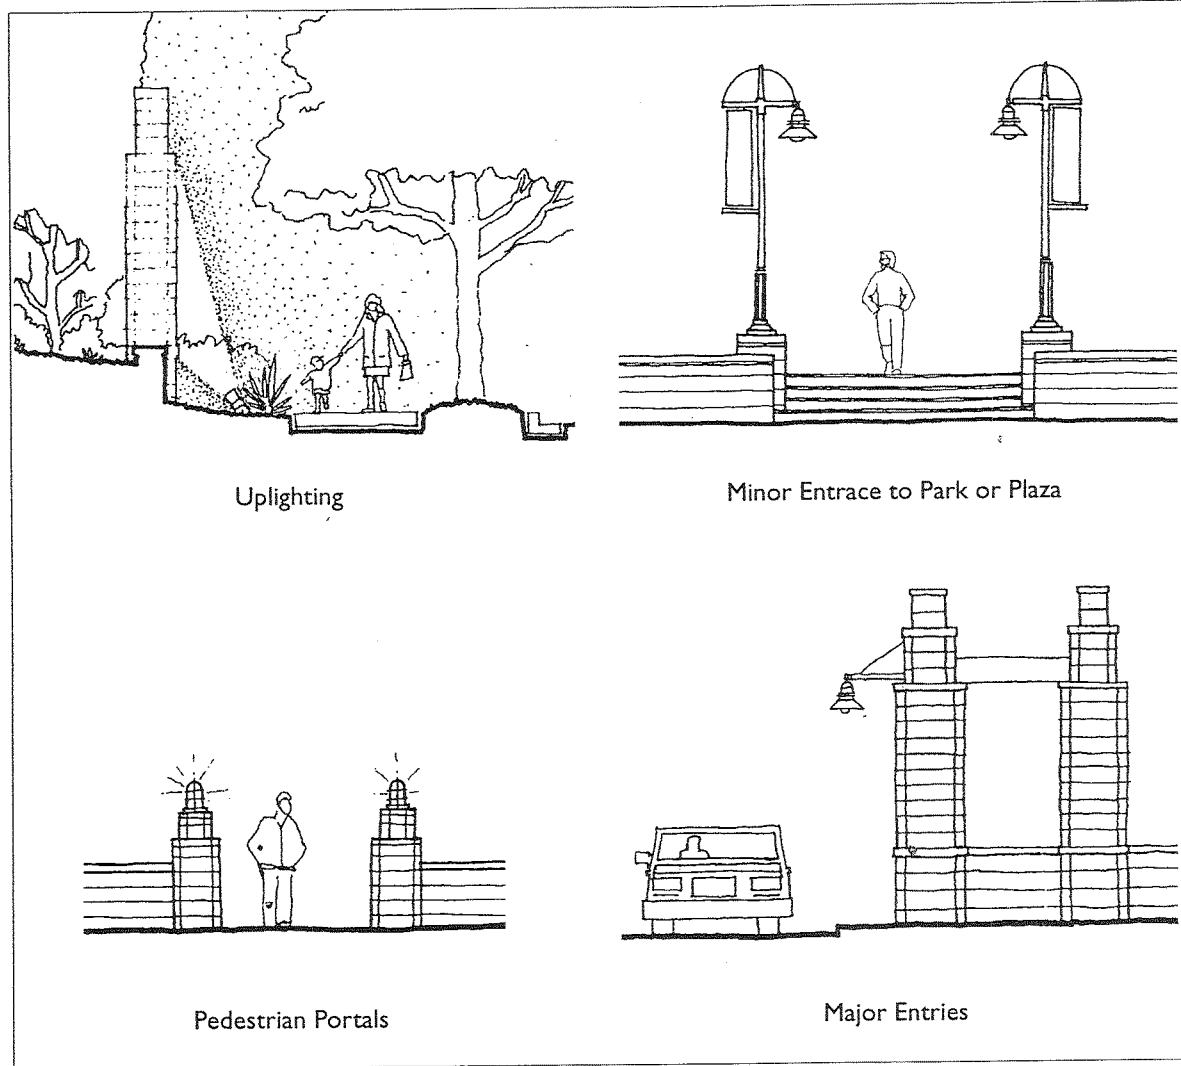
, Village Wall Lighting. The Village Wall can be lit in a number of appropriate ways. Up-lighting of the Village Wall is encouraged for its entire length, but light sources should be screened from view. Lighting can also be integrated into the design of the Village Wall, especially at entrances.
